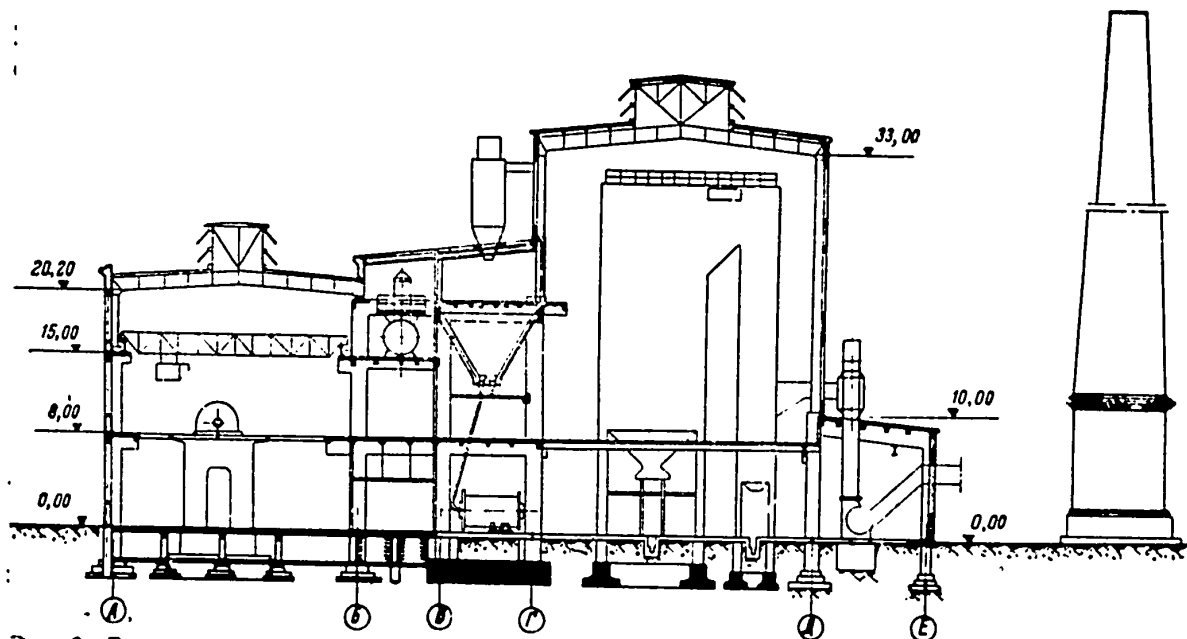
Frame construction in precast reinforced concrete and steel.
